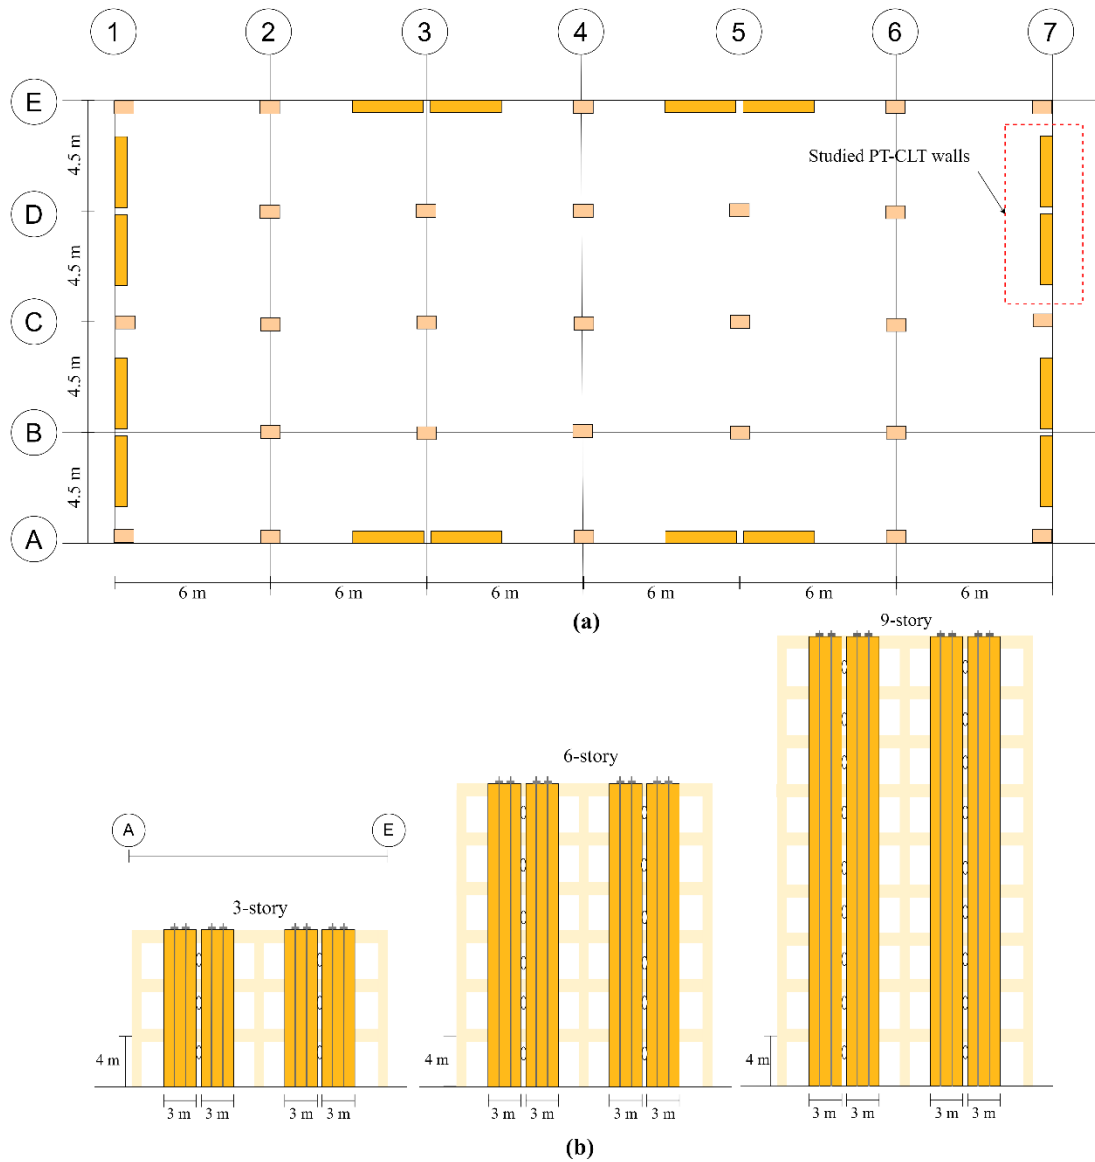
(a) Typical floor plan and (b) schematics of 3-, 6-, and 9-storey prototype buildings.
